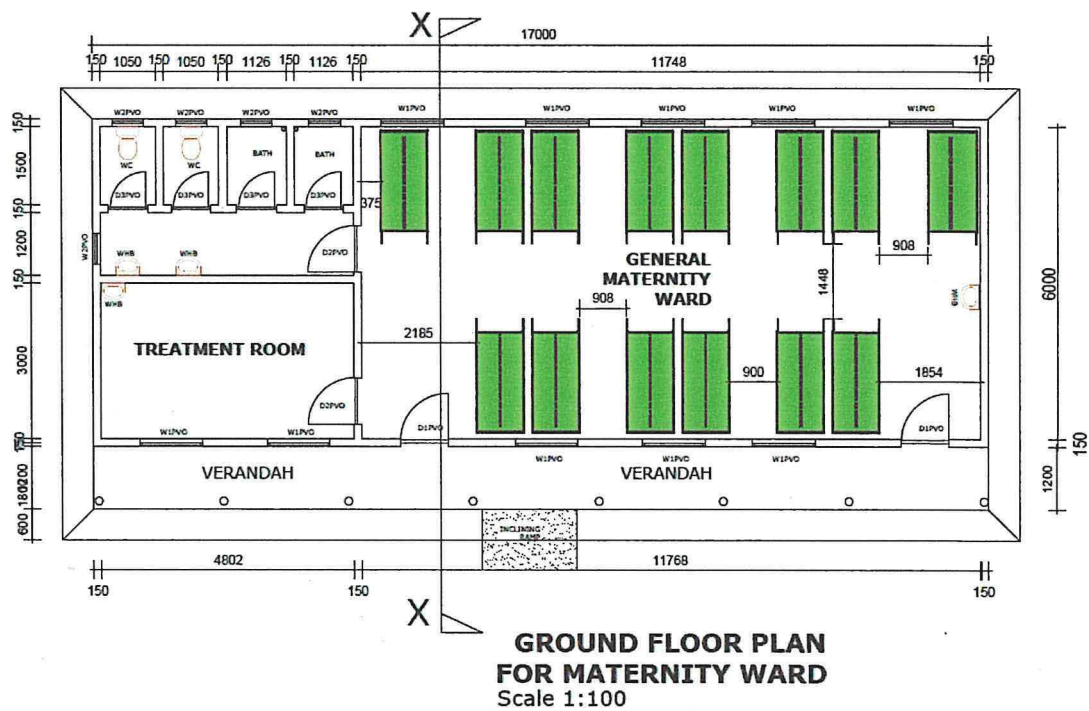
Proposed Ground Floor Plan of a Maternity ward.
